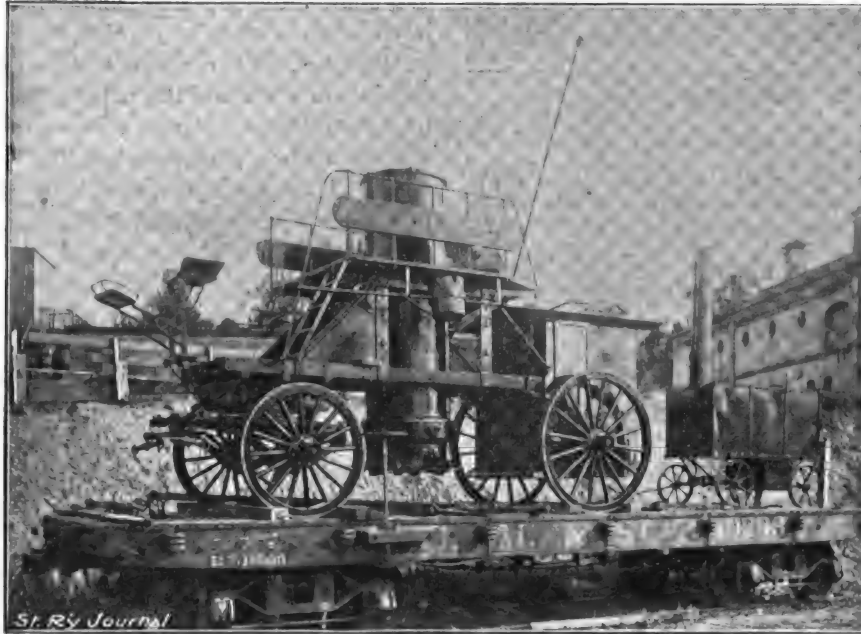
PORTABLE CUPOLA AND MOULD HEATER FOR CAST-WELDED RAIL JOINTS.
